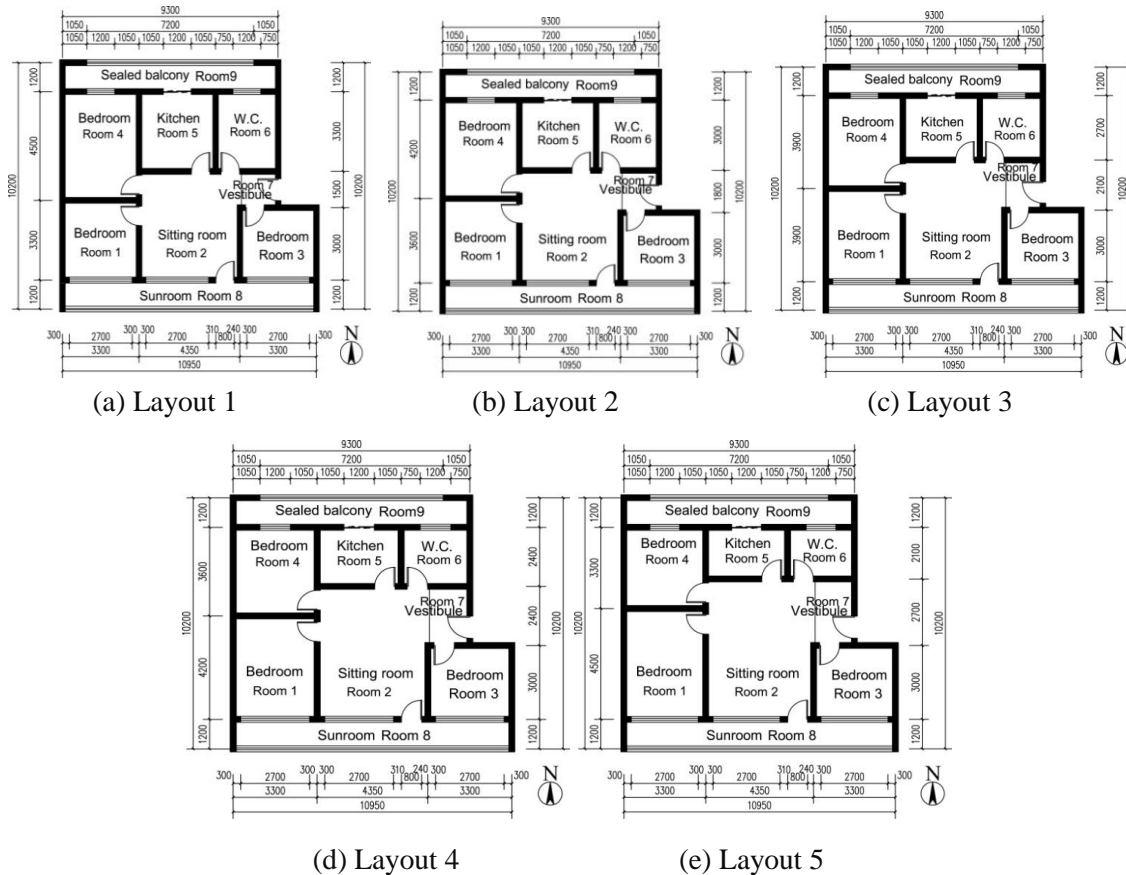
18 South and north room layout design models for double-balcony unit (unit: mm)
